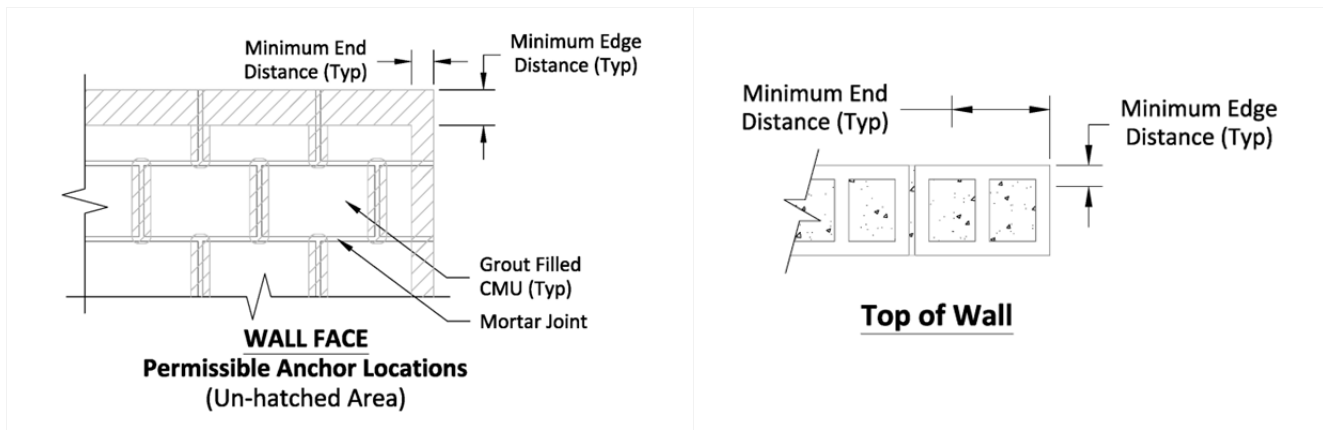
POWER-STUD+ SD1 EXPANSION ANCHORS INSTALLED INTO GROUT-FILLED CONCRETE MASONRY
